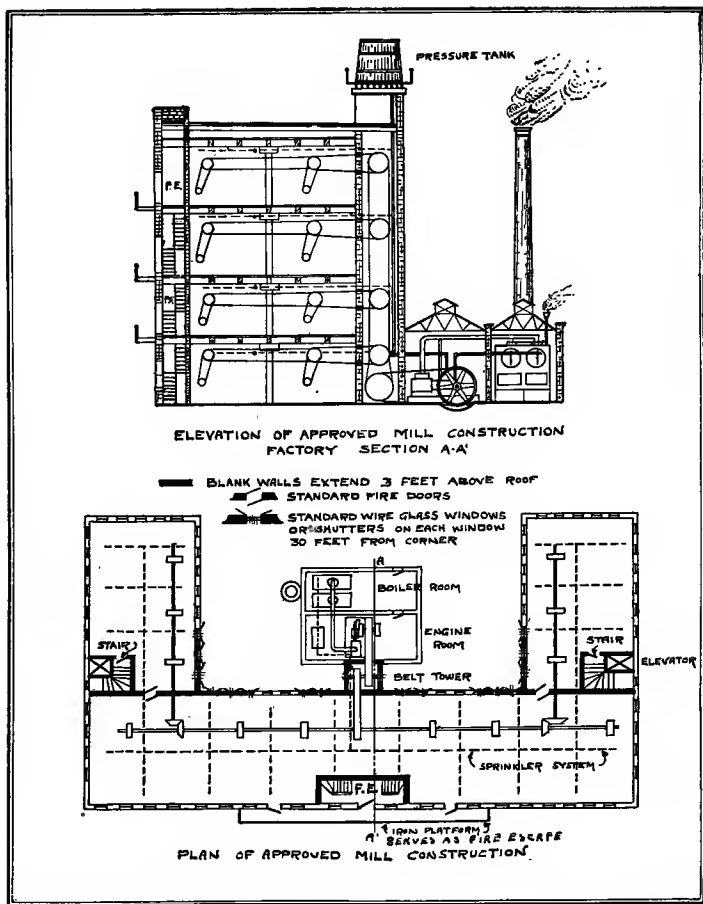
Elevation and Plan of Slow-Burning Construction.
